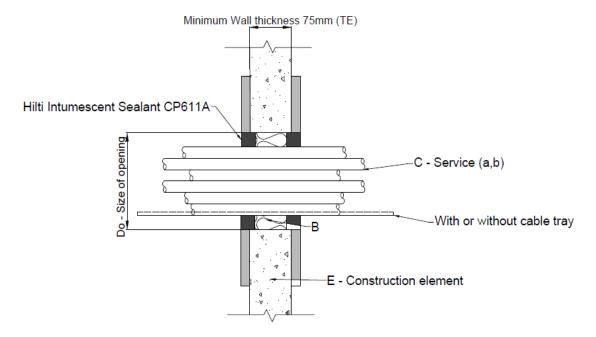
Side View, seal type 4 AS 1530.4:2014 D2 Standard Cable Sets. 75mm Concrete Wall + AP2. CP611a. Refer to table 15
